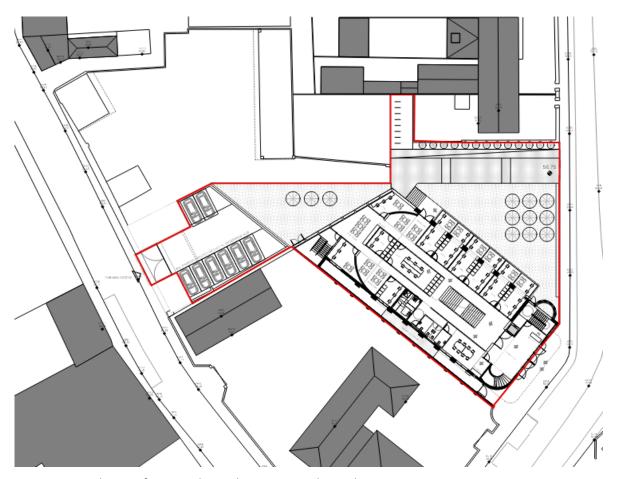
Site layout of proposed Digital Enterprise Hub Development
